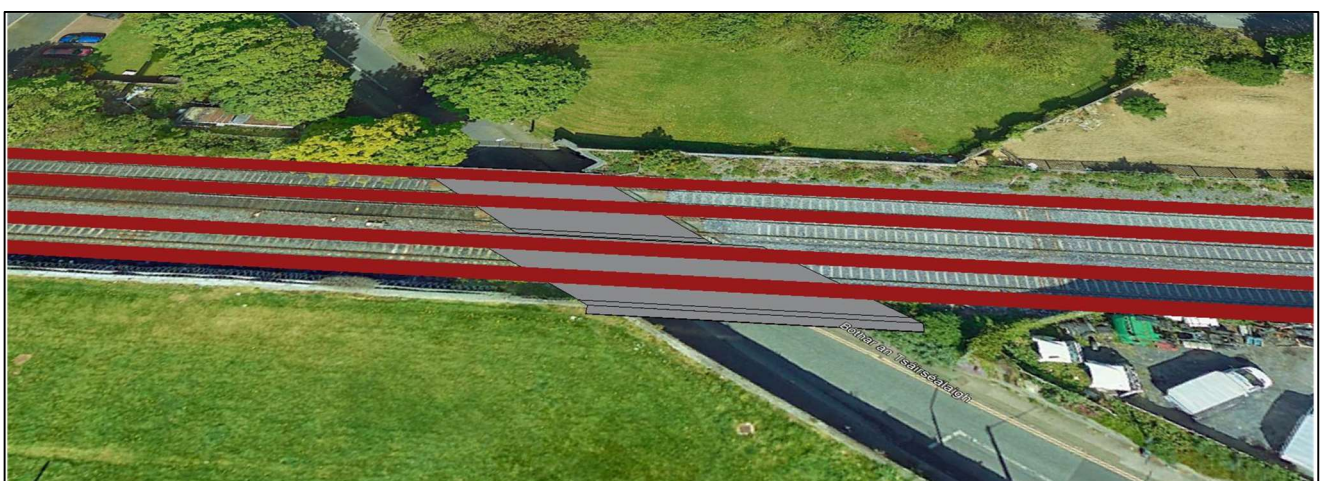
Sarsfield Road Bridge (UBC4) – Option 2 in Plan
